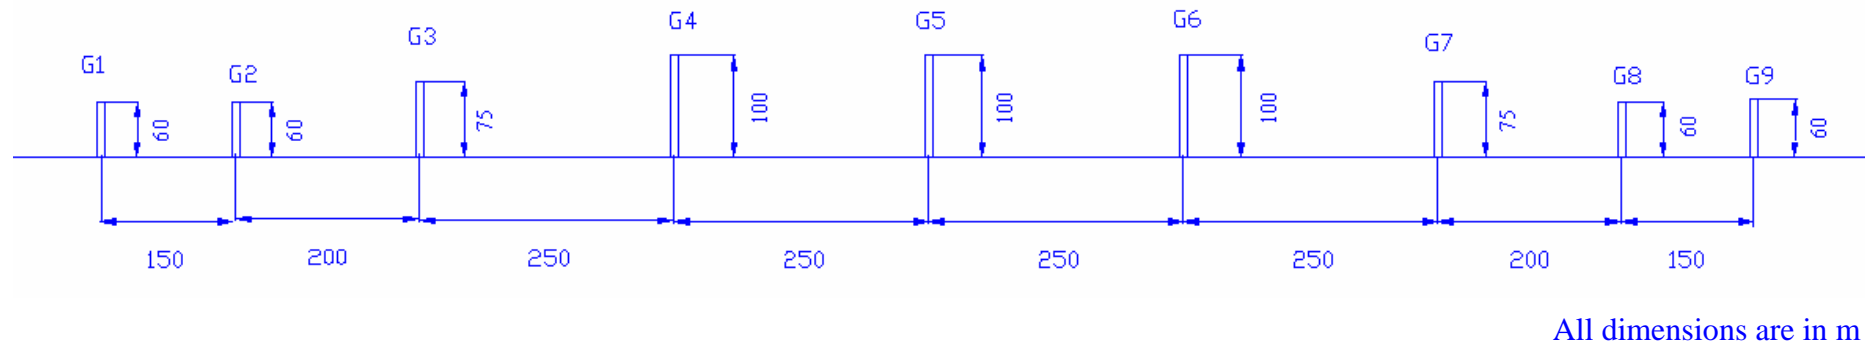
Proposed layout of the groin field for the coast of Paravoor
